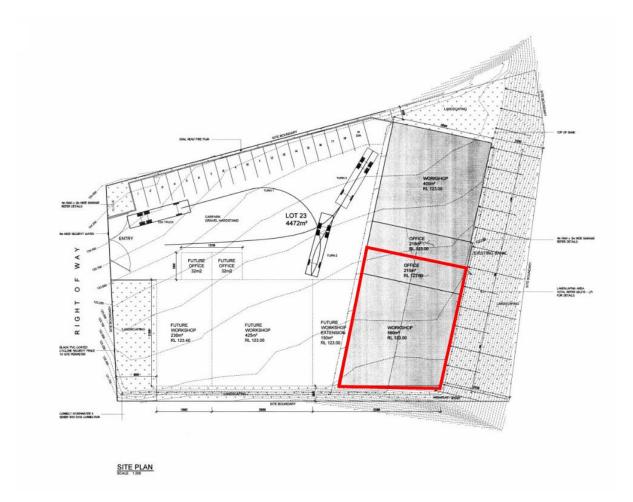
Site Plan (noting all building noted as 'future' has now been developed)
